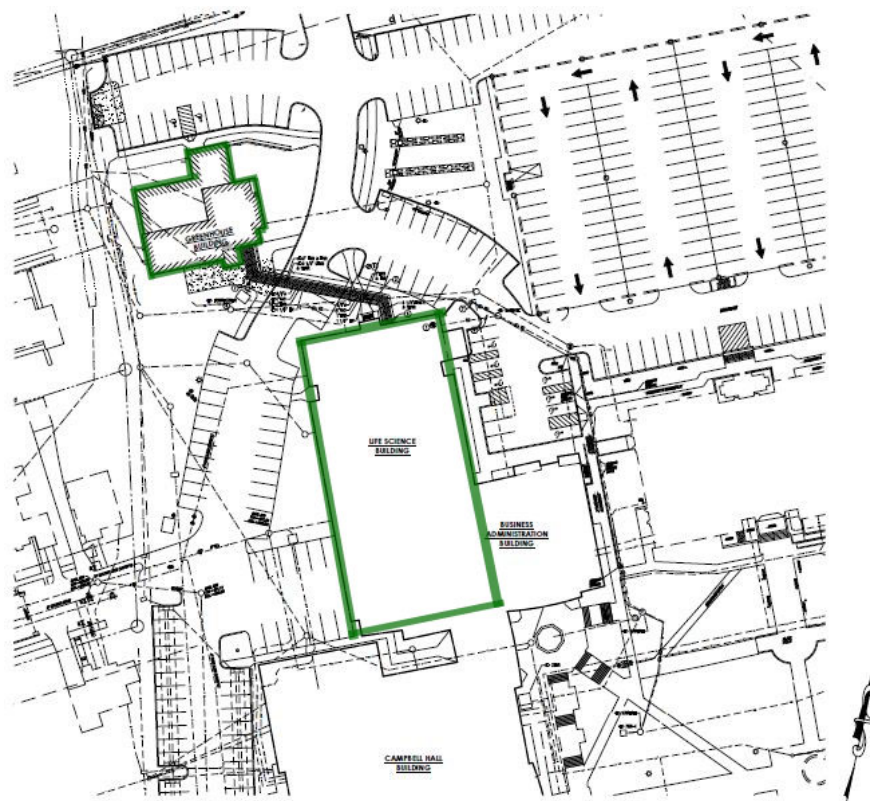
Site Plan (Life Sciences and Greenhouse Buildings Outlined)
